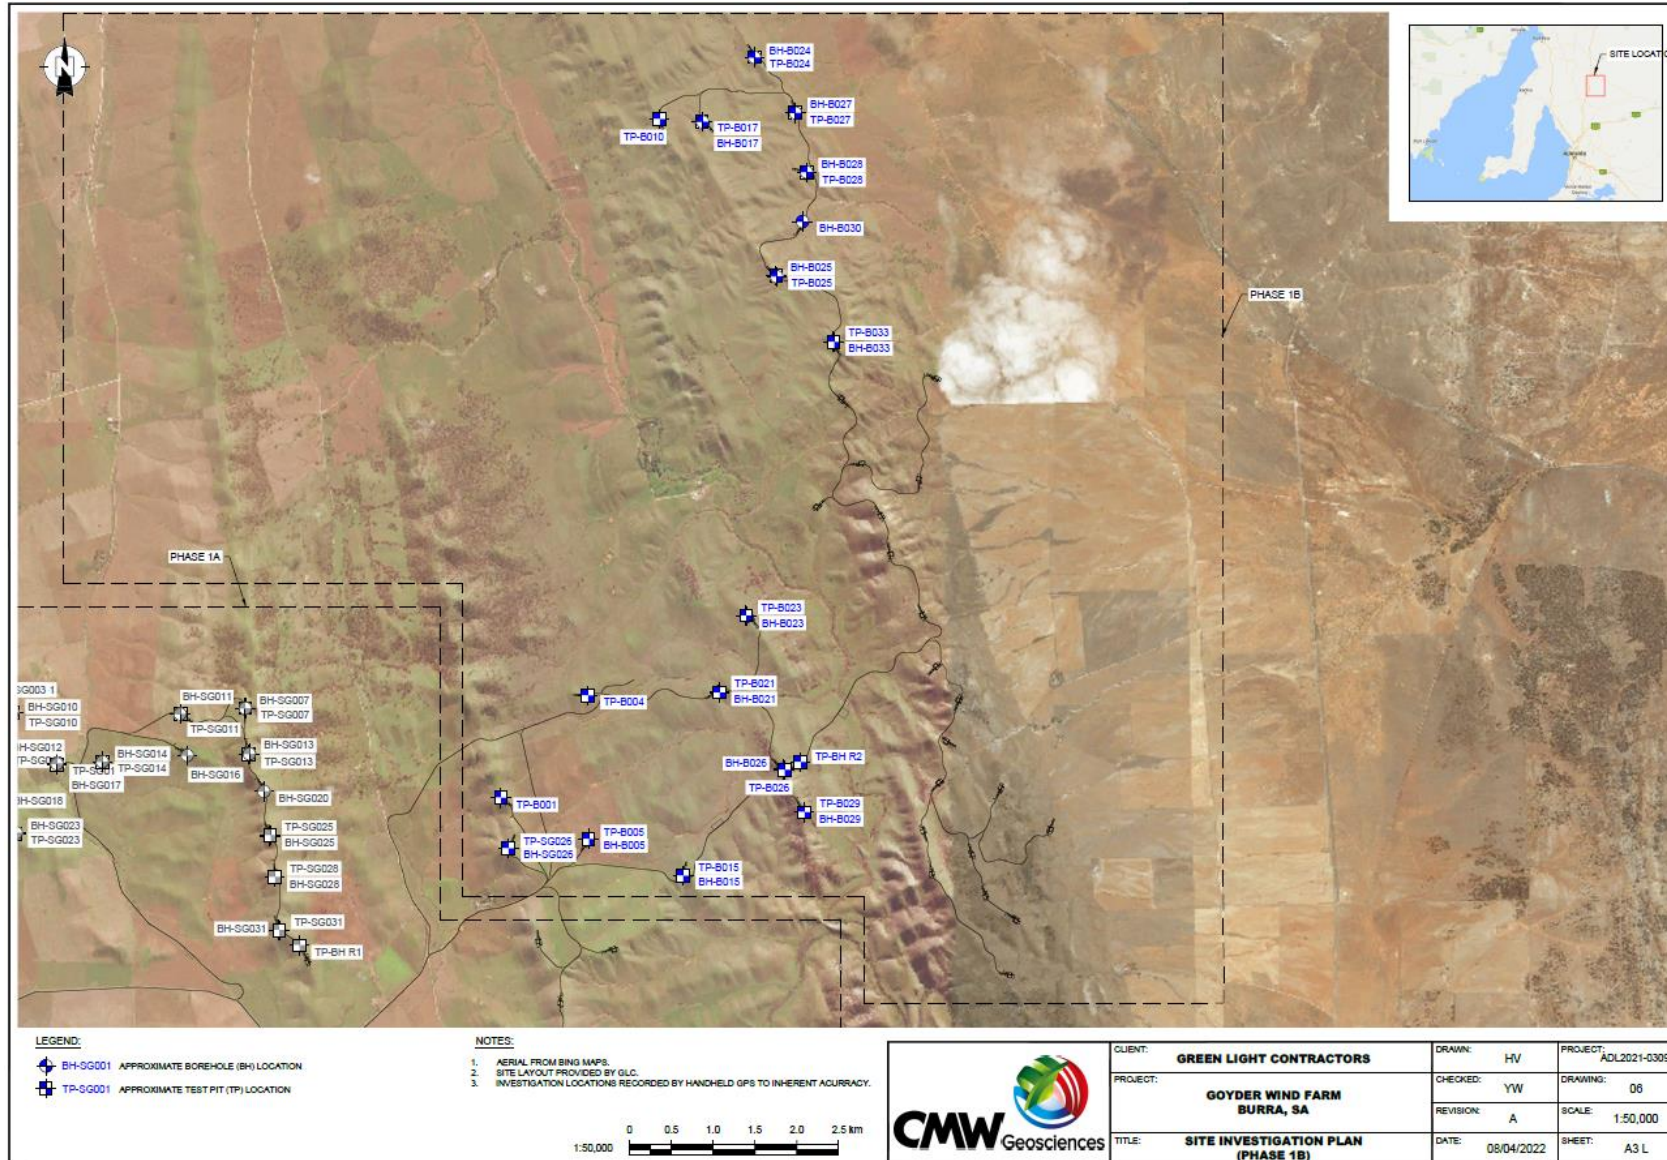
Geotechnical Assessment Site Identification Plan (Stage 1B)
